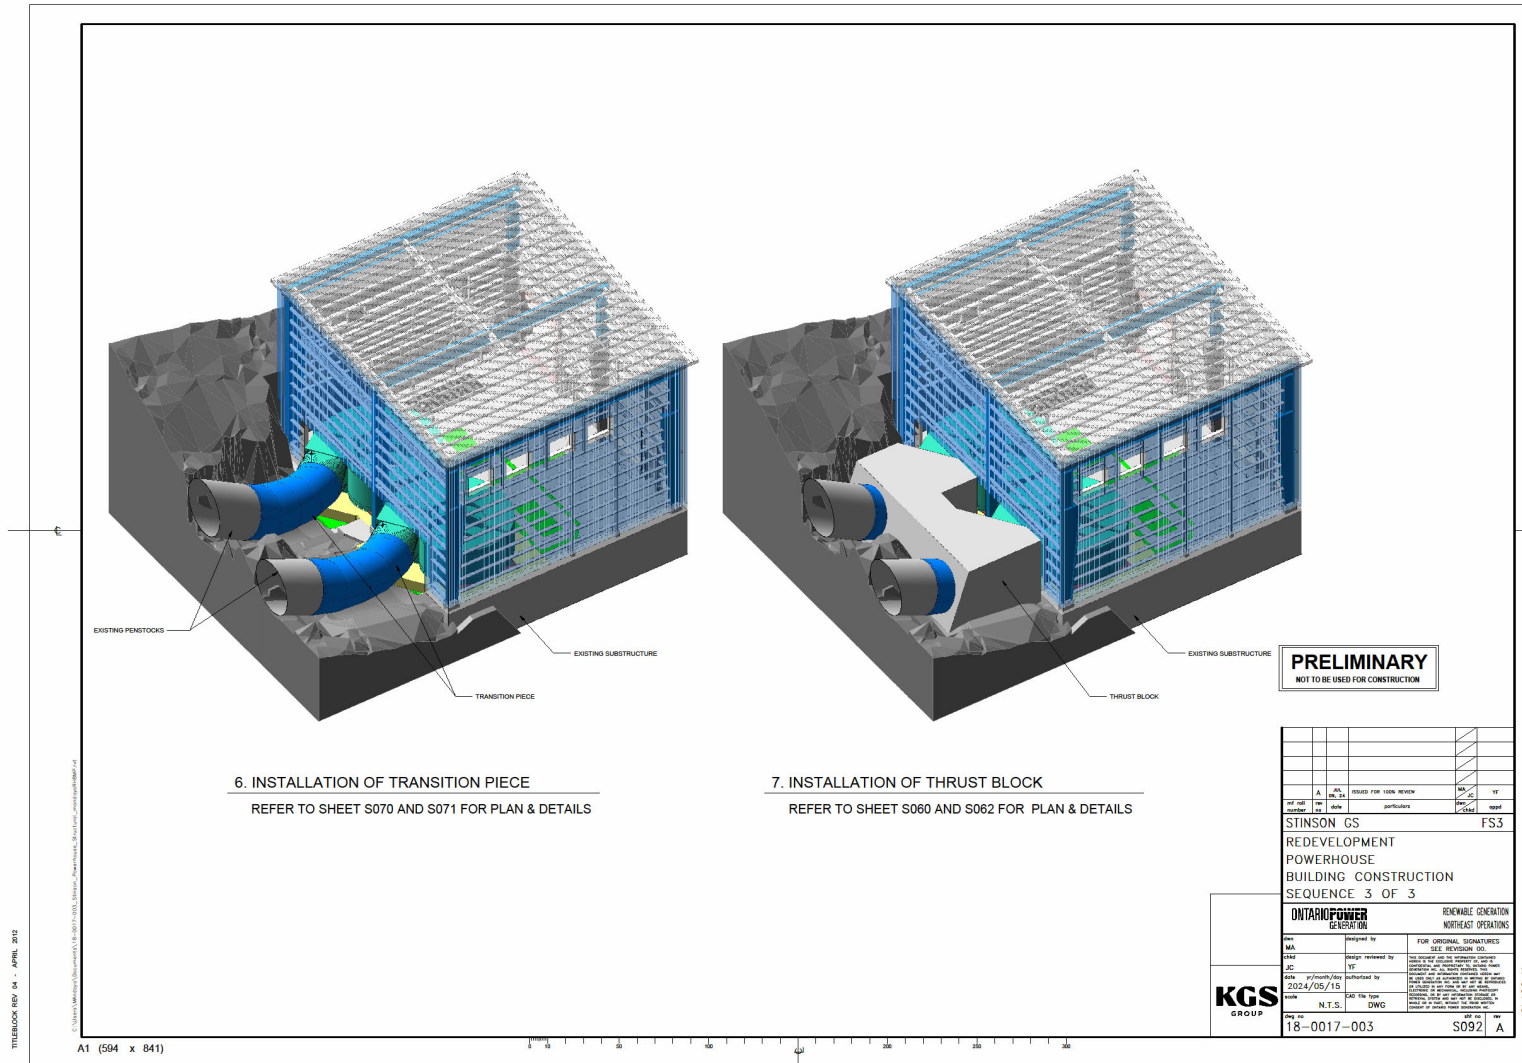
Powerhouse Construction – Installation of Transition Piece and Thrust Block
